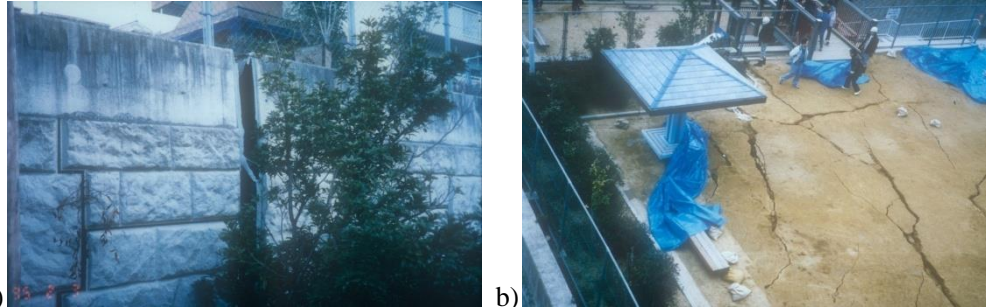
Large opening at a vertical construction joint; and b) cracks on the crest of backfill of a Terre Armée wall for Hoshiga-oka Park, Kobe City, during the 1995 Great Kobe Earthquake (JTAA, 1995; Tatsuoka et al., 1997b).
